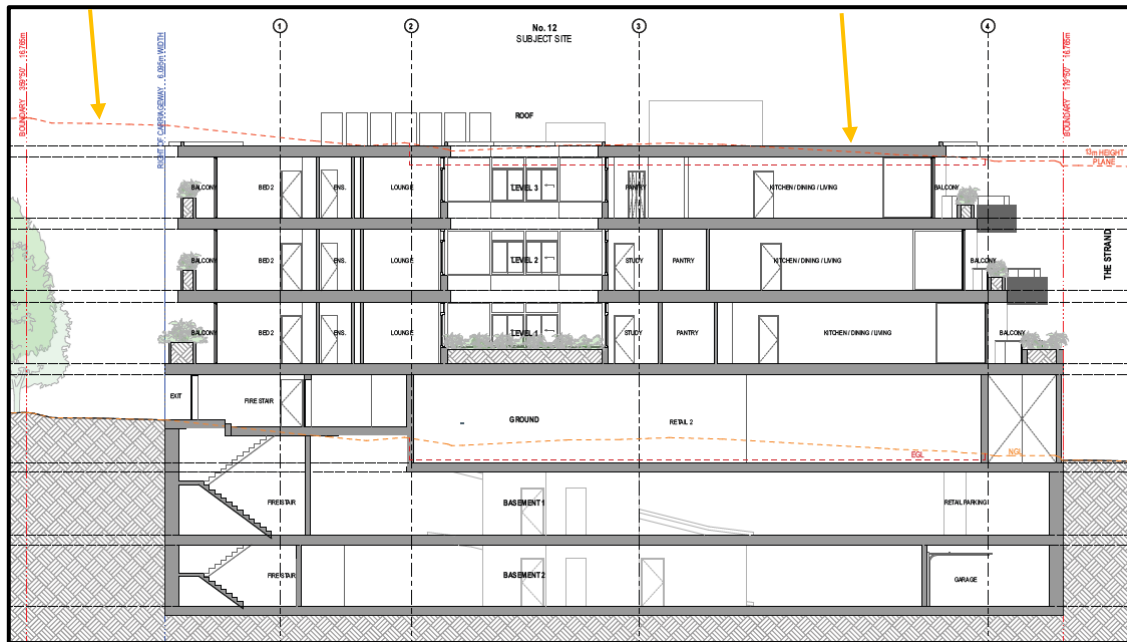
Extract of Section Plan, illustrating maximum building height above EGL
